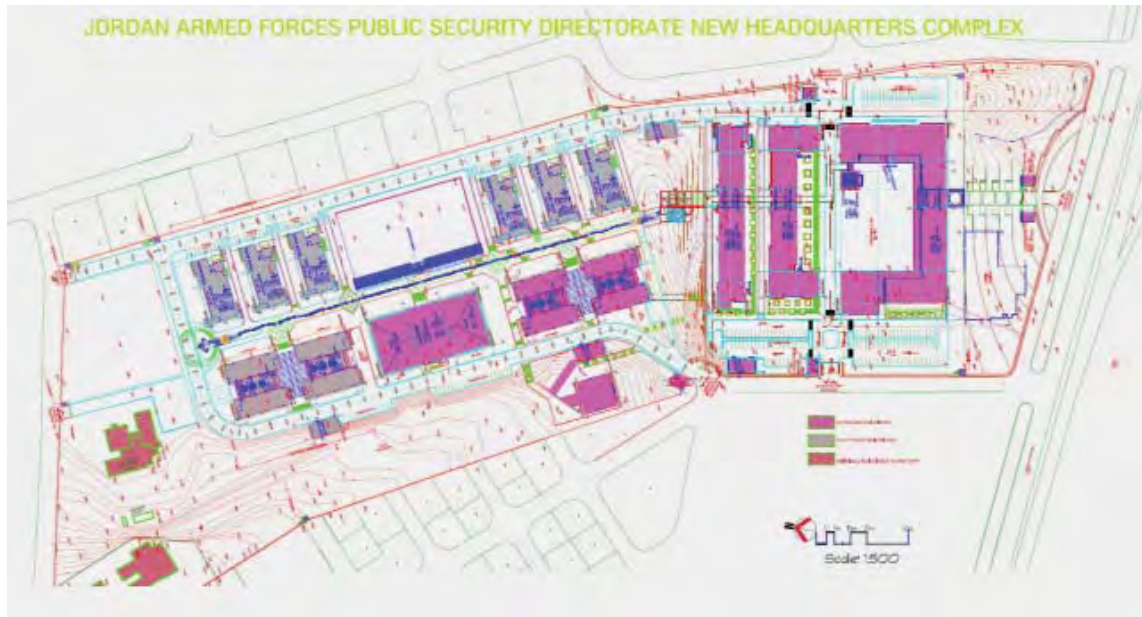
Site Plan of the PSD Complex. (Source: Authors).
